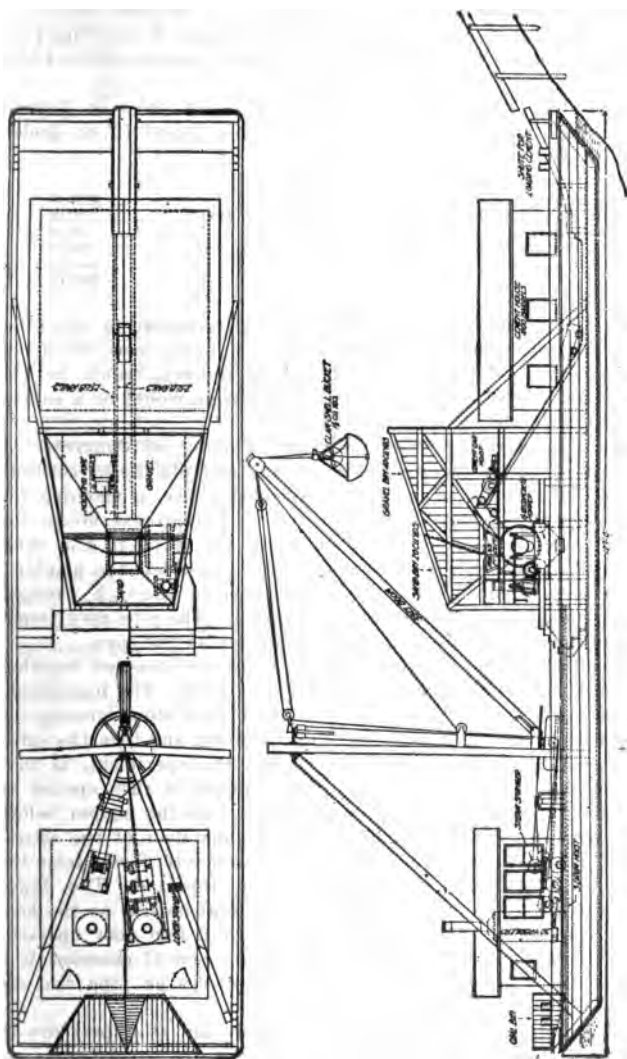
General Plan of Floating Concrete Mixing and Handling Plant.
